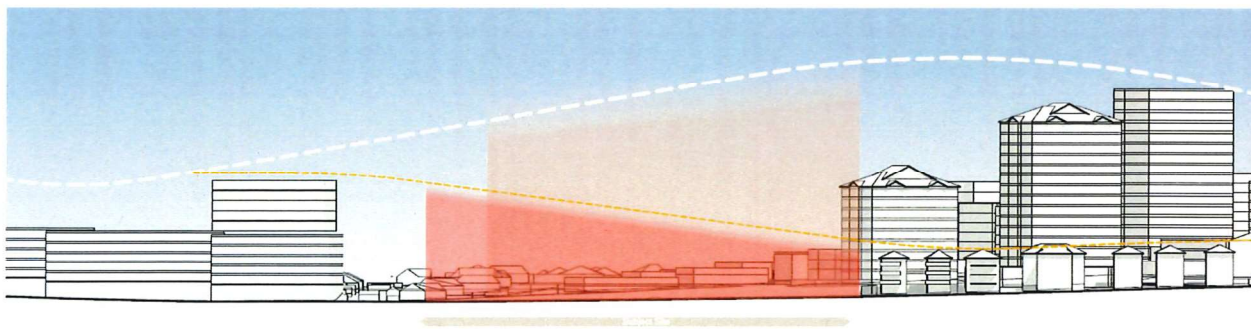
Gloucester Road elevation showing transition with surrounding context.
